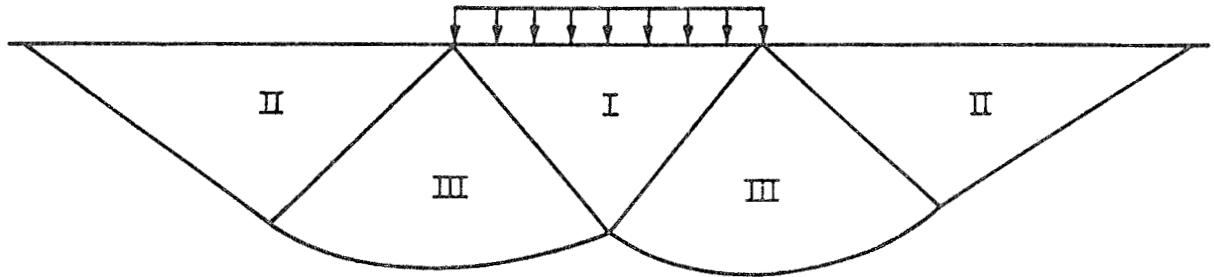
Shear zone at failure of an earth supported strip footing
